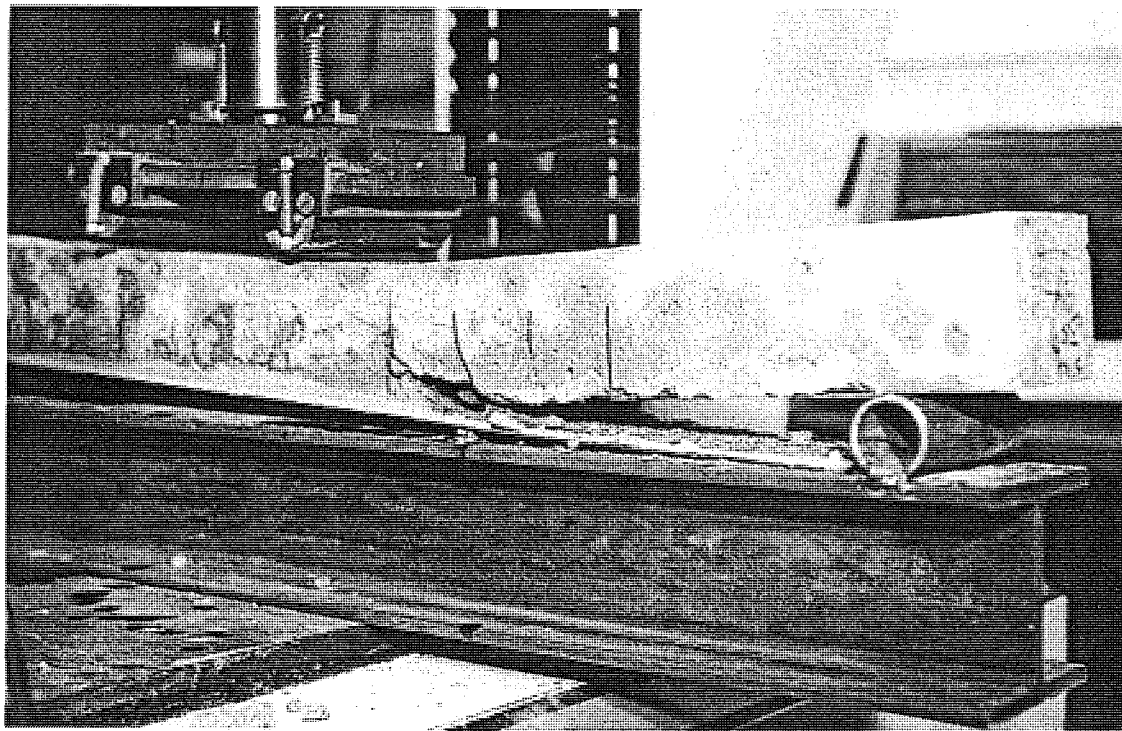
Sika System. Failure Mode: Flexure-Delamination
